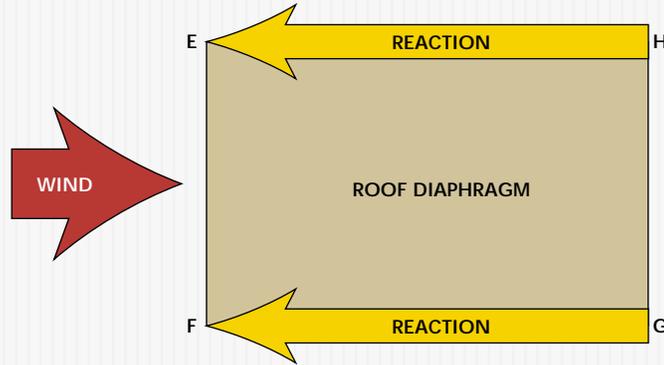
Roof to wall connections – fasteners must be able to transfer forces between roof and walls
